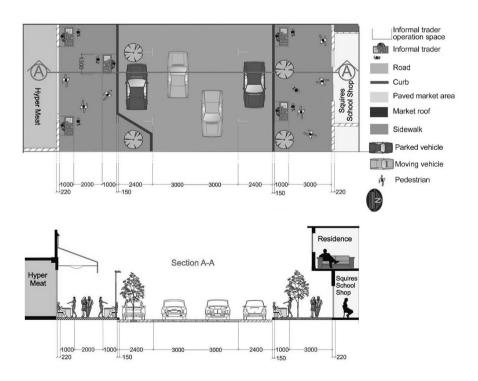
Plan and cross-section of a portion of Raleigh Street, Yeoville Source: Author, 2014
